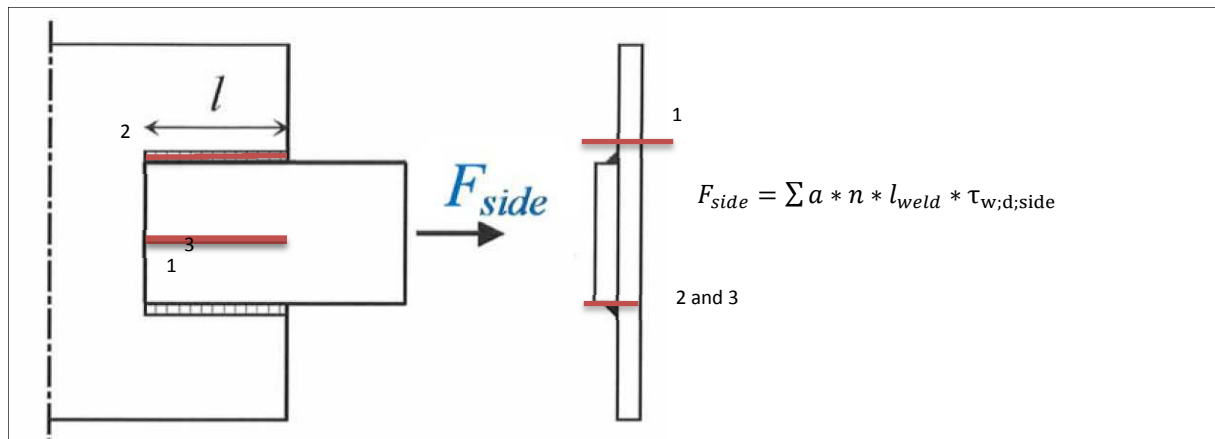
Side fillet welds, source; CIE 4115
